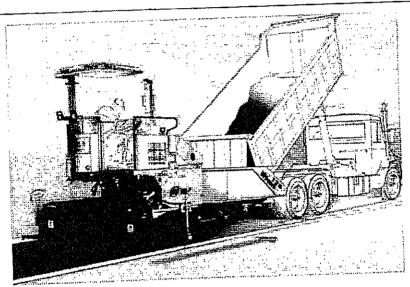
Applying Asphaltic Concrete by Asphaltic Concrete Pavement
